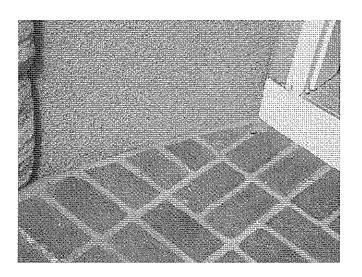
/ Typical cement stucco termination at brick front porch and rear patio.
